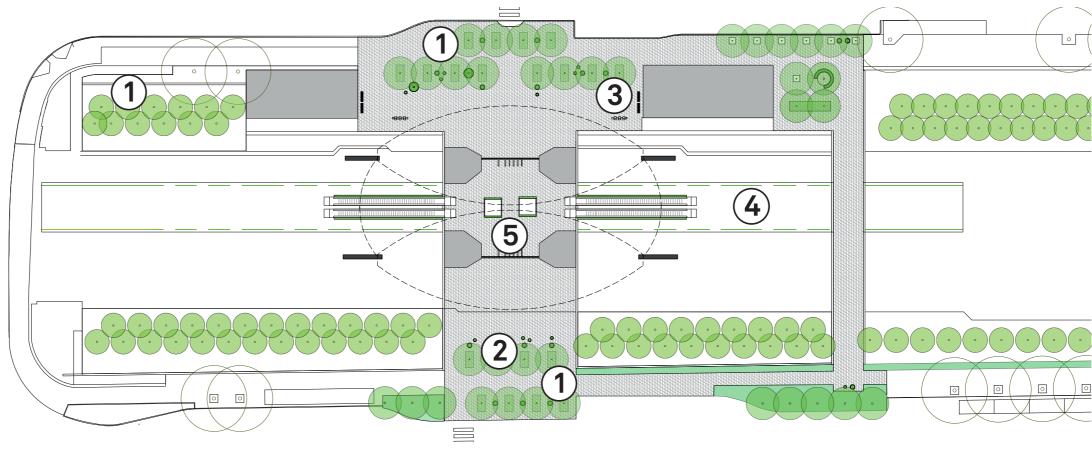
CUD\_Cudgegong Road Station Public Art Precinct Plan. Source: MWA with T+C Studio.
